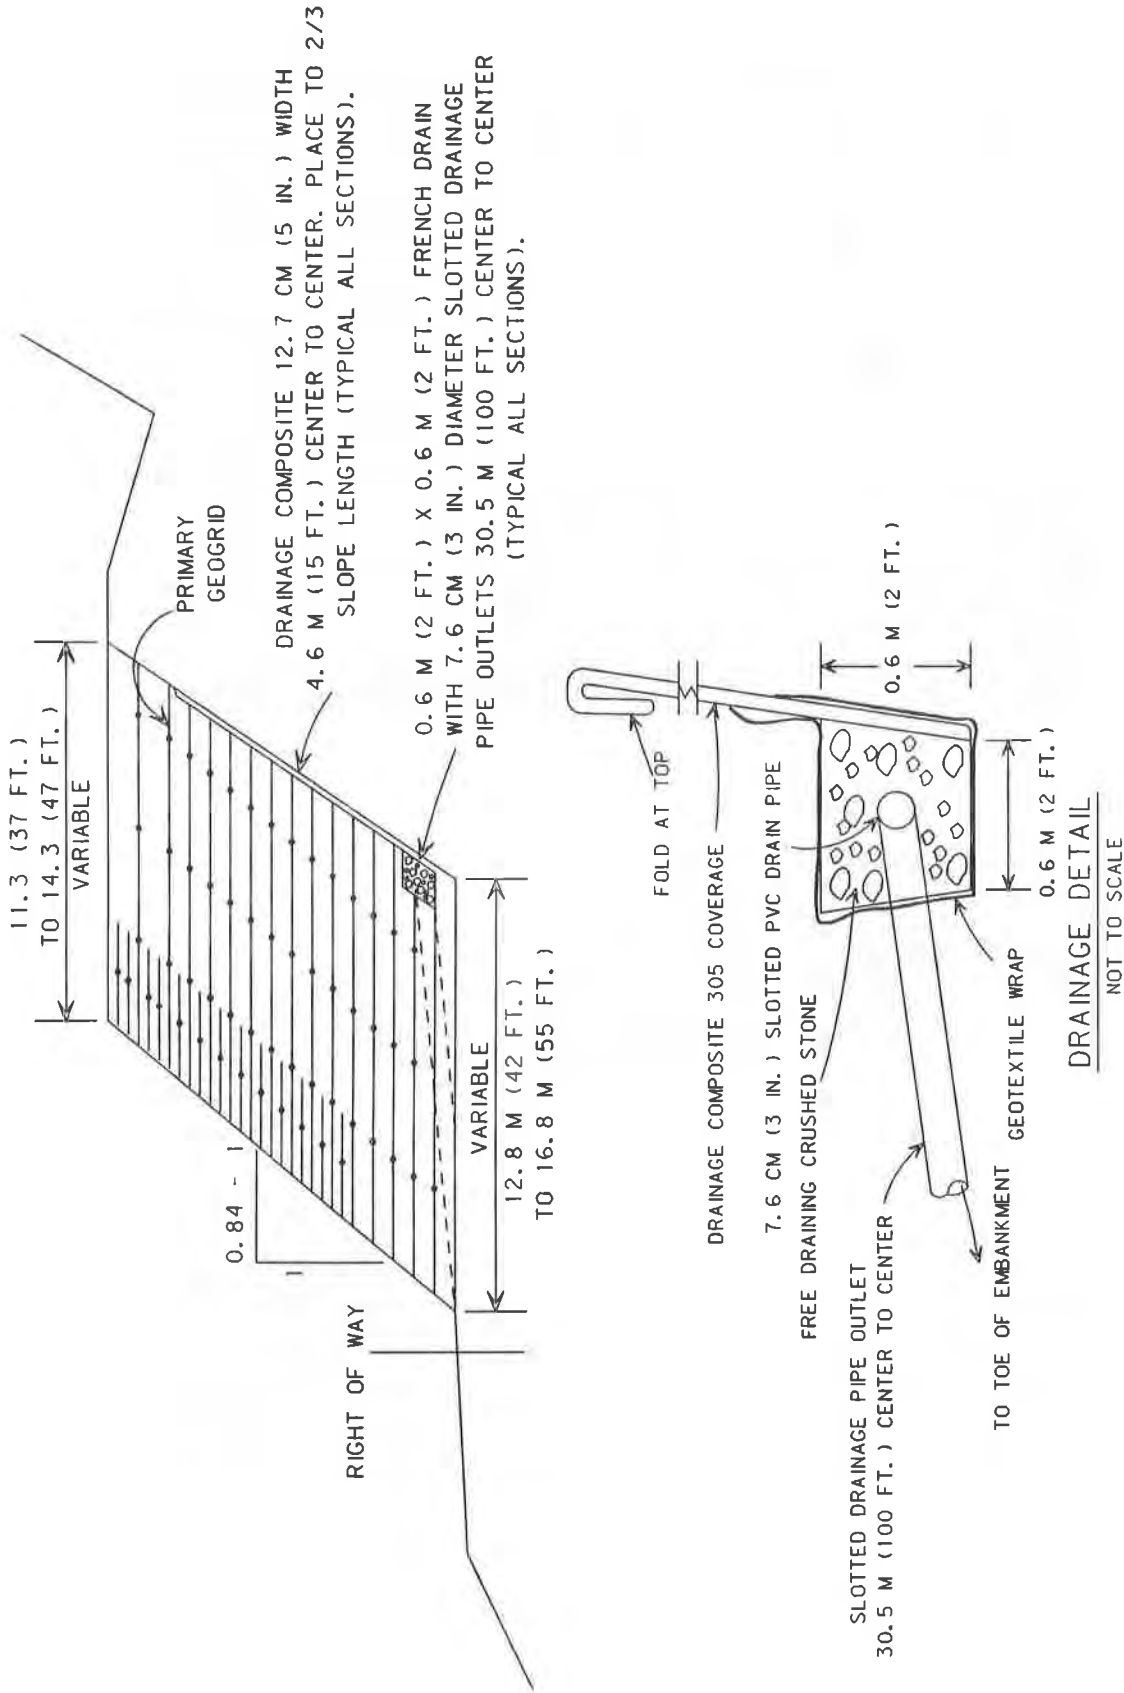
A TYPICAL GEOGRID DESIGN SECTION
